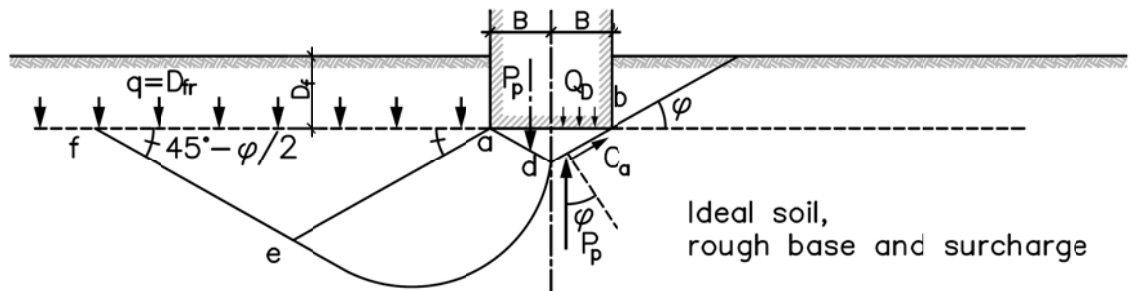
Failure mechanism at the tip of cylindrical piers (after from Terzaghi, 1943)
